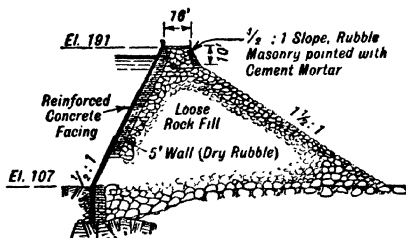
Section Through Beaver Park Dam, Colorado.
